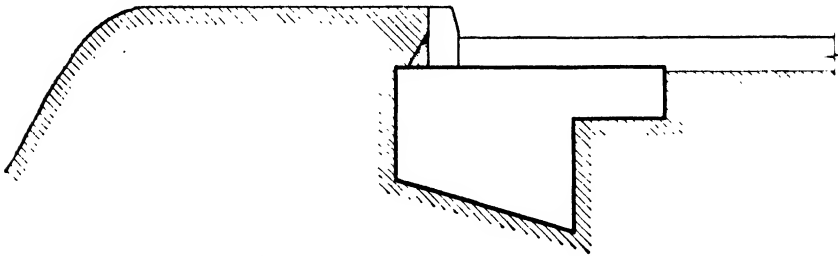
HAUNCHING TO NEW ROAD ON EMBANKMENT.
